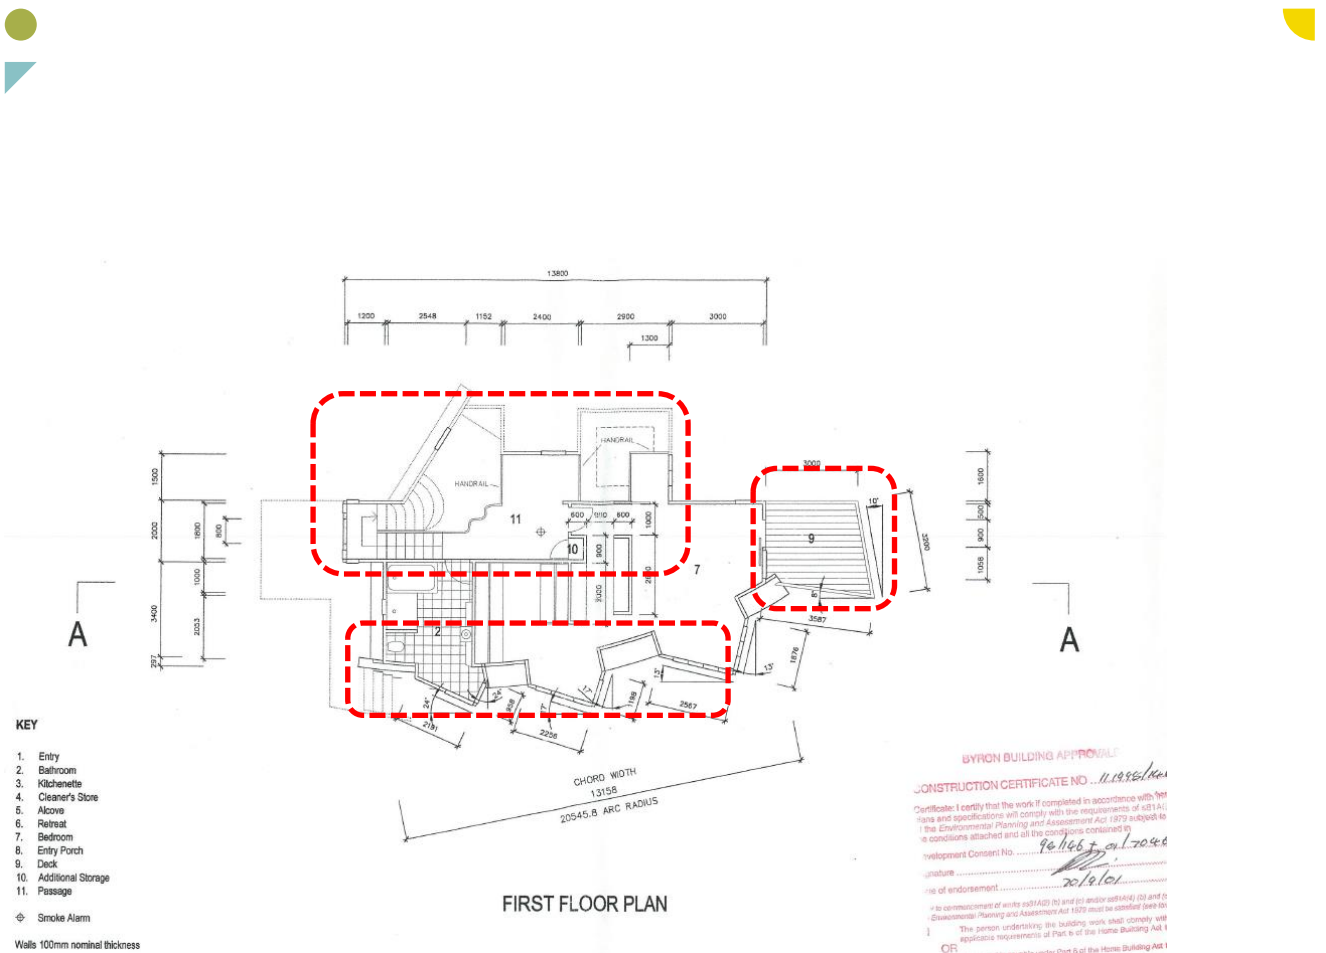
Extract from "Type B" first floor CC stamped plans (11.1998.146.1)
